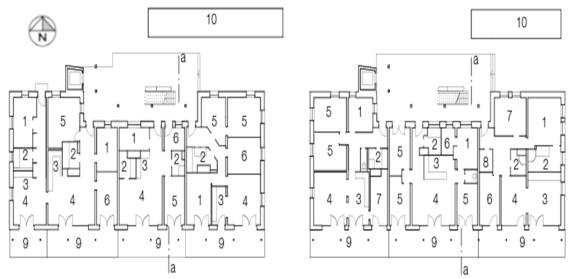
Plan of Klee house, 1 Bedroom 2 Bathroom 3 Kitchen 4 Living area 5 Playroom 6 Office 7 Guest room 8 Storage room 9 Balcony 10 Bicycles storage (Voss et al., 2013)
